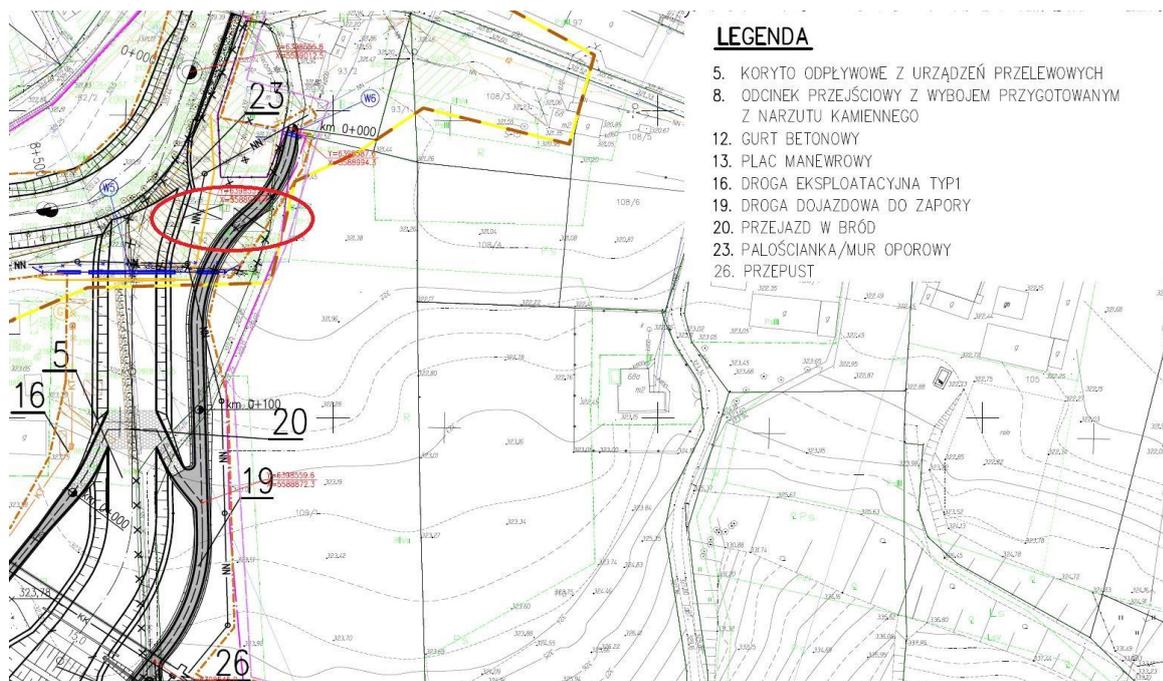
Utility buildings in Szalejów Dolny to be demolished.
